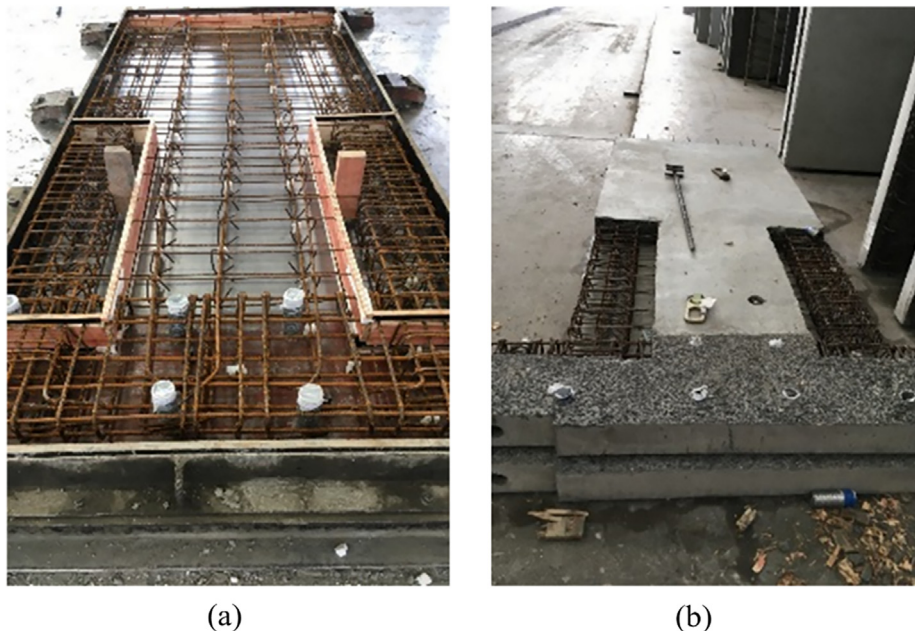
ECC wall construction: (a) formwork prior to casting, (b) partially cast wall.
